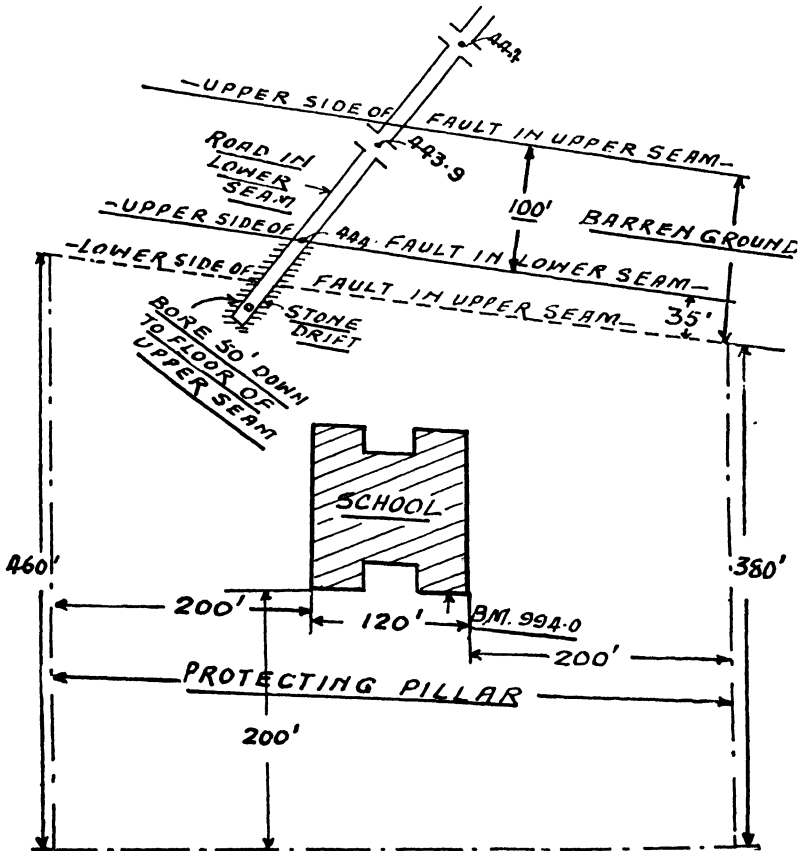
Plan showing Protecting Coal Pillar for School.
